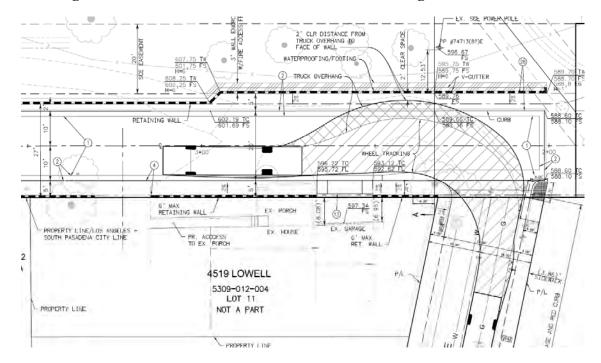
Private Portion of Moffat Street Connecting to Lowell Avenue
